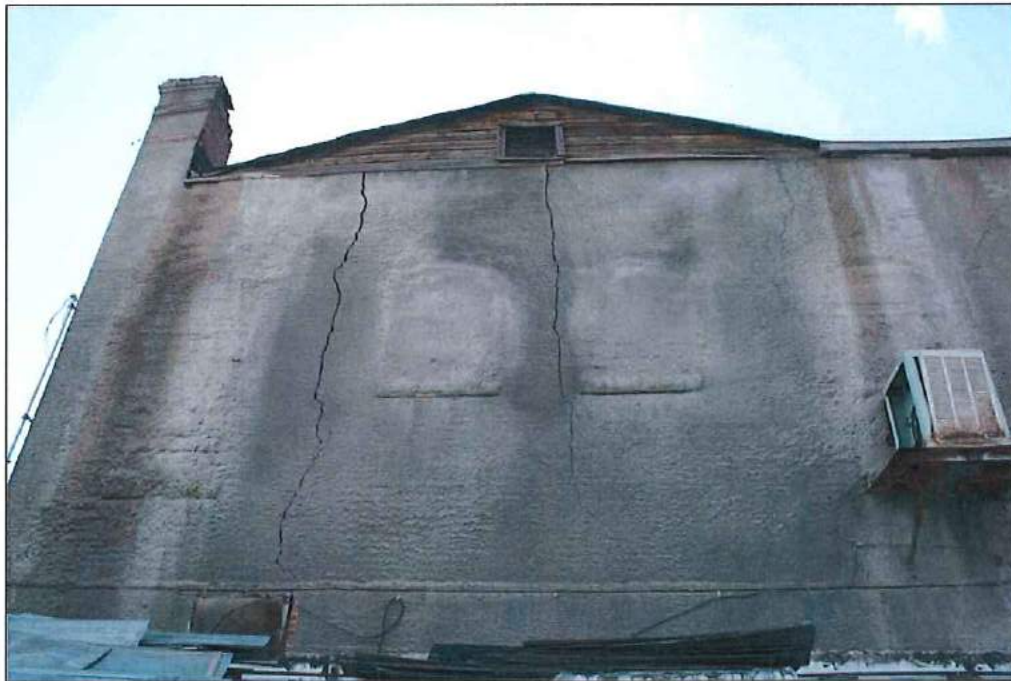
of 16: East (rear) elevation showing gable roof and gunnite covering, looking west, July 2013
